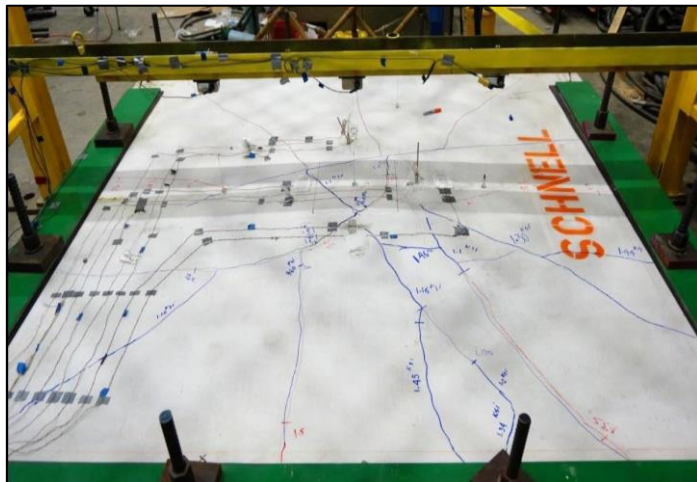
Cracks Pattern for Sandwich Slab Specimen B
